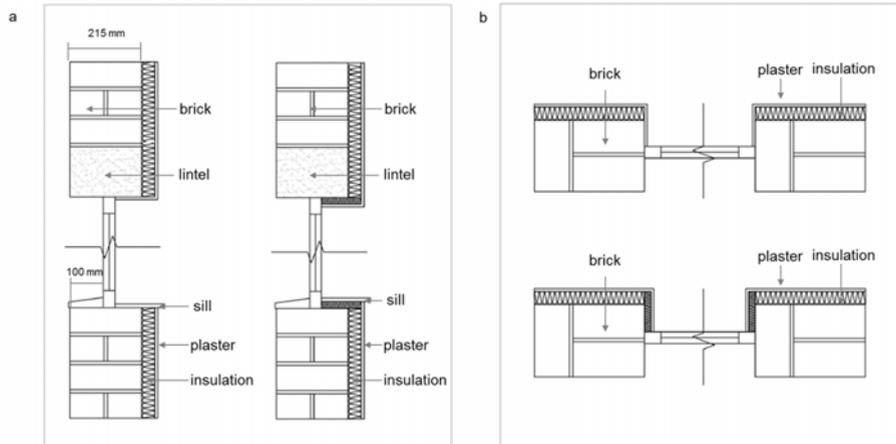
(a) cross section detail of thin external wall, uninsulated (left) and insulated (right) reveals; (b) plan detail of thin external wall, uninsulated (top) and insulated (bottom) jambs.
